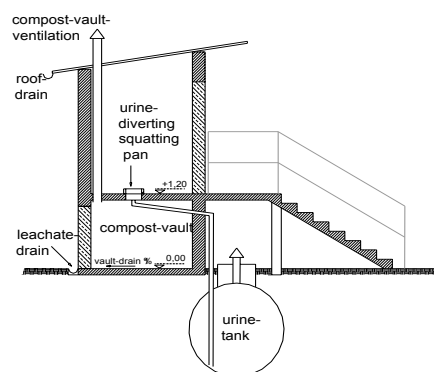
Schematic cross-section of school toilet facility. Garla Mare (Source: S. Deegener, TUHH)
